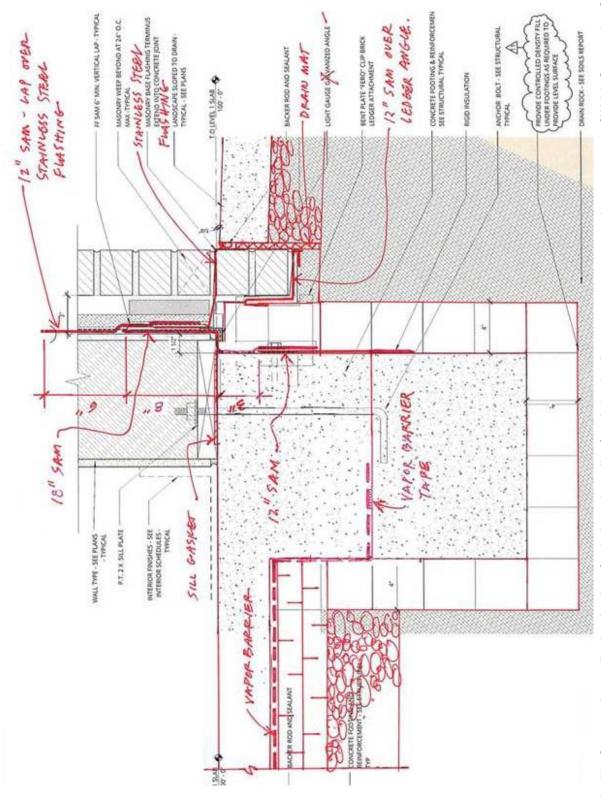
Contractor's coordination drawing of typical exterior wall to foundation detail
